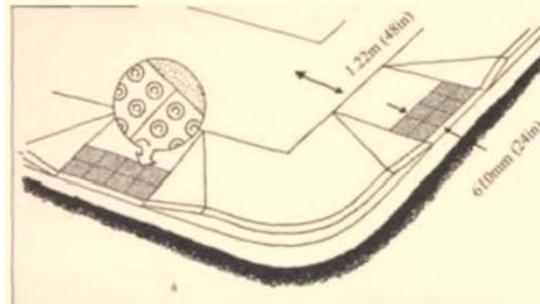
Sidewalk Ramp with Cross Pan, Vertical Curb
